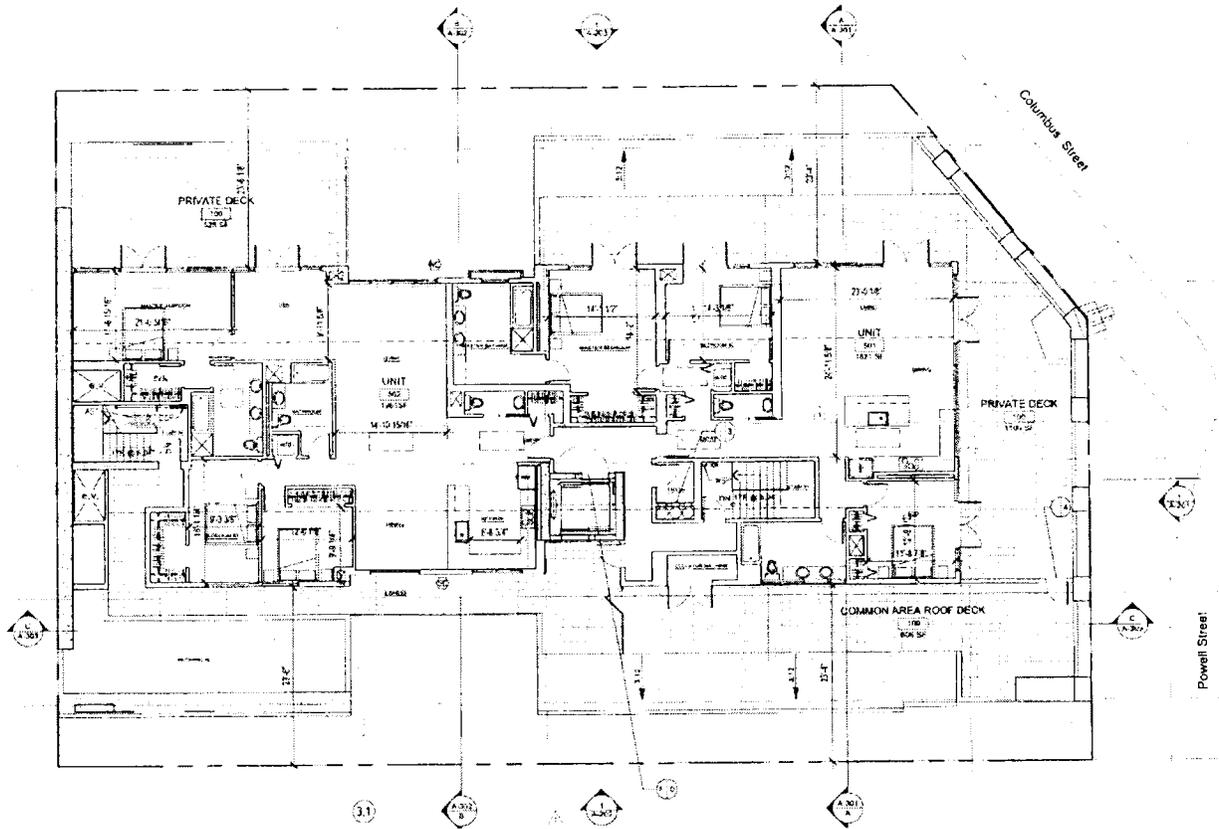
PROPOSED 1731 POWELL ST FIFTH LEVEL PLAN
